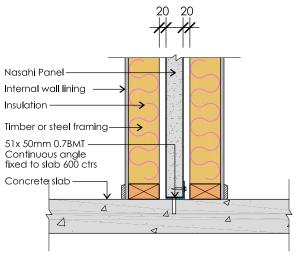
Base Slab Connection (Continuous C Section Track)
